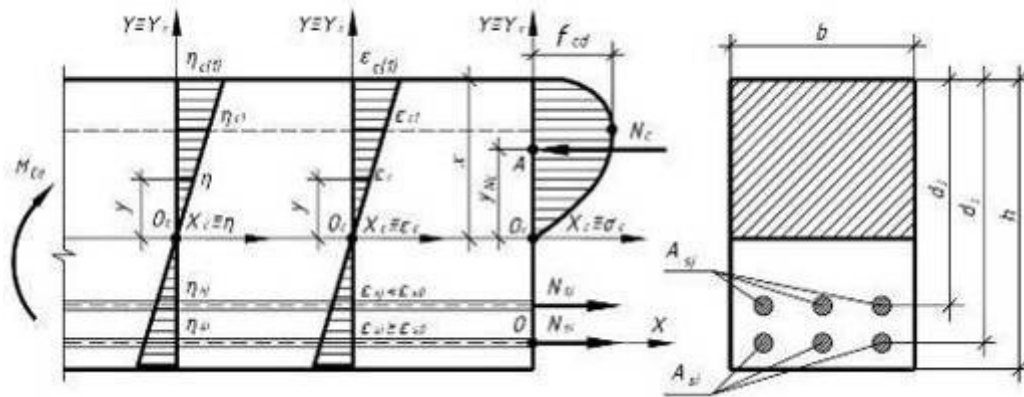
Design scheme of the reinforced concrete beam with multi-row arrangement of tensile reinforcement
